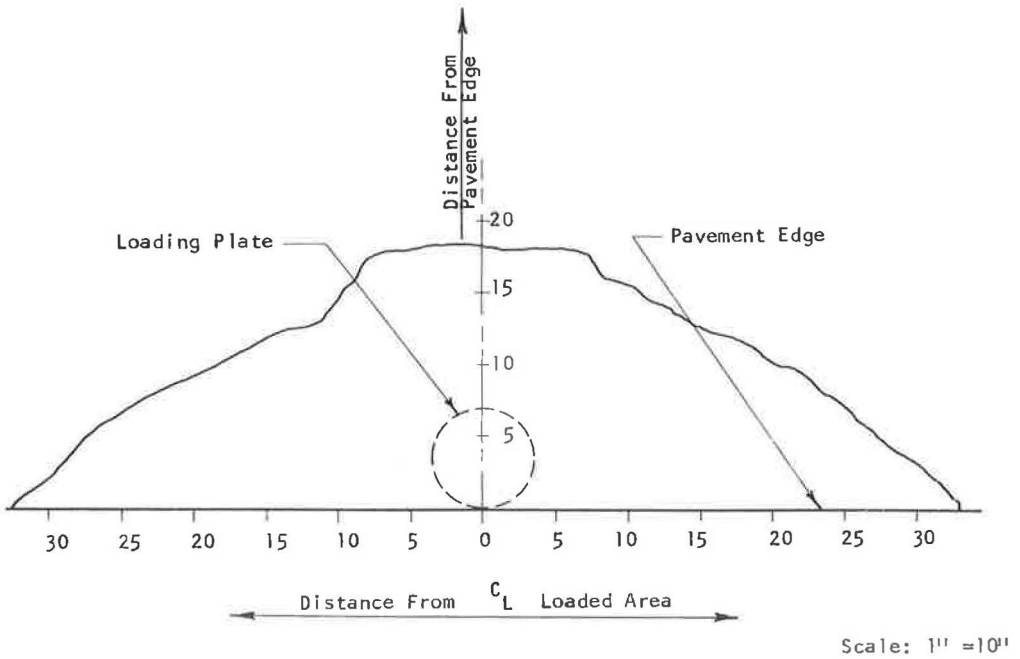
Load No. 6: crack pattern on surface of pavement at end of static load test.
